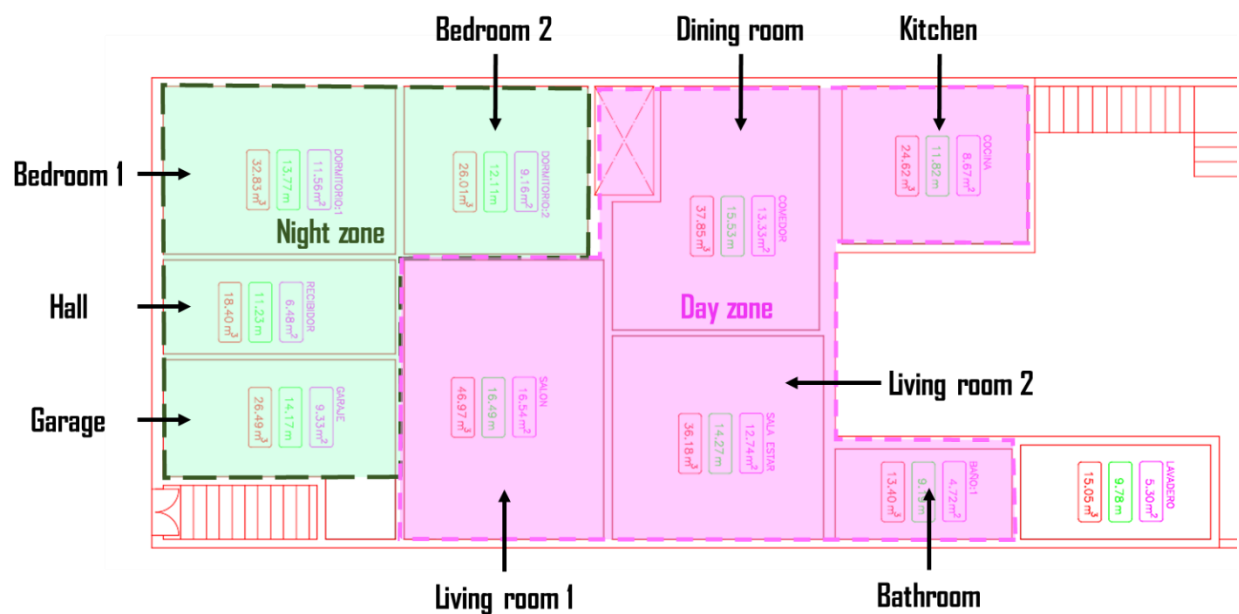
The internal distribution of the ground floor with thermal zones proposal (Archetype 3).
